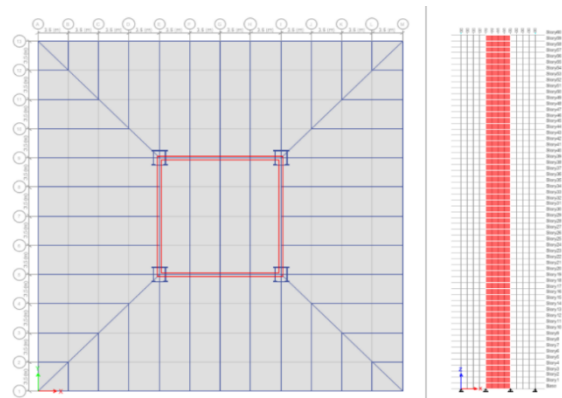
Typical Floor Plan and Sectional view (Diagrid System)
